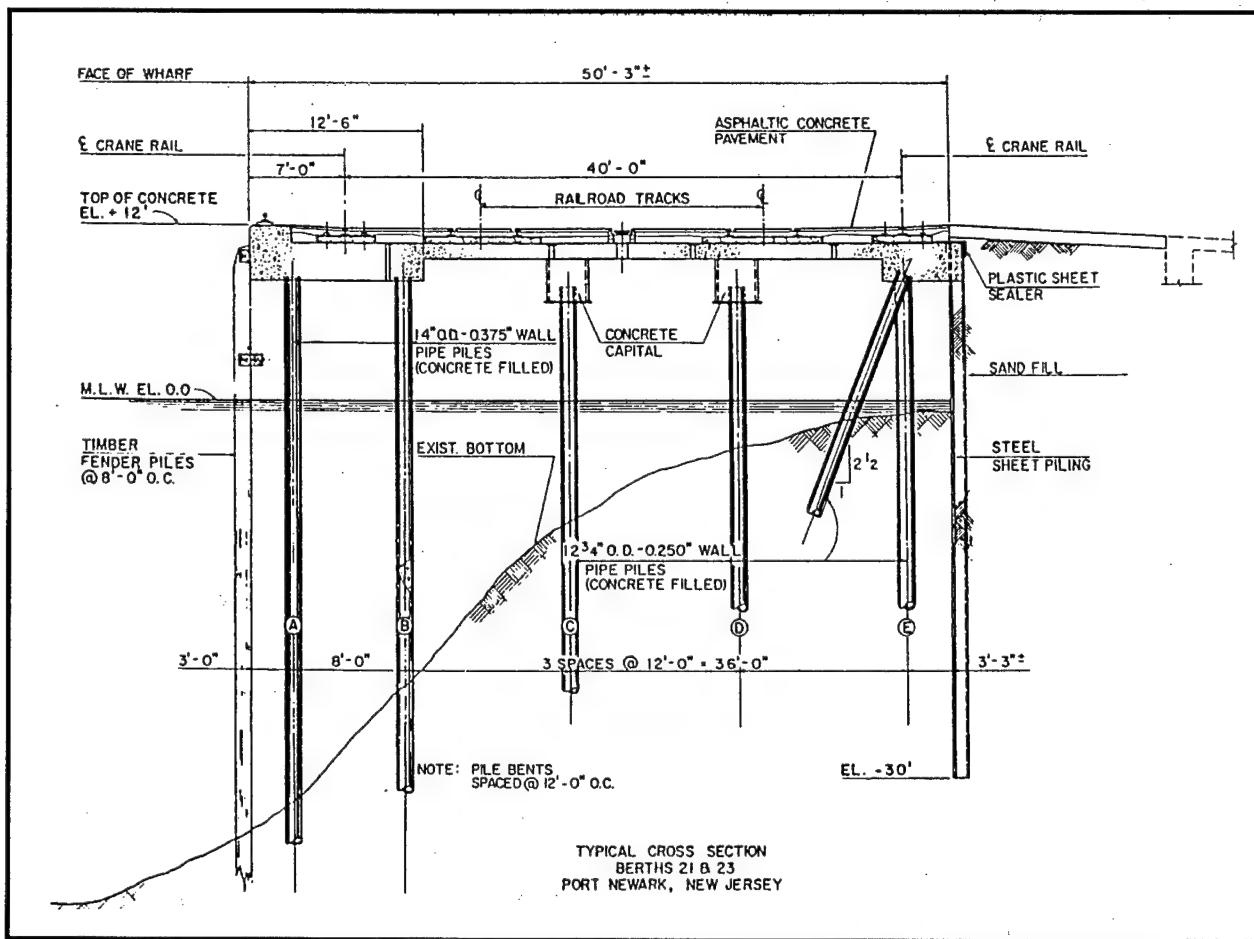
Typical construction details for pier at Port Newark, NJ, (courtesy the PA NY/NJ).
